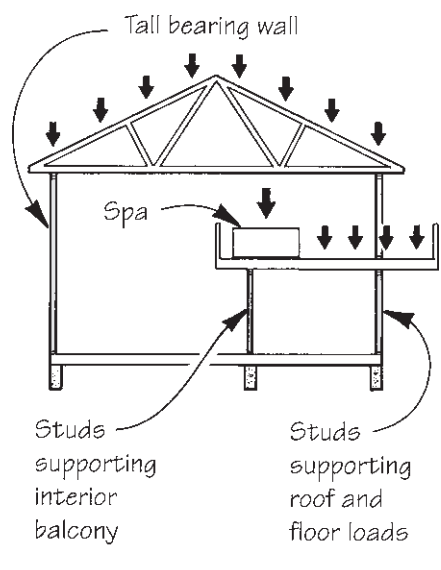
This building section illustrates three areas where you might need to check for stud buckling: tall bearing walls, exterior walls carrying unusually high combined loads, and unsheathed interior bearing walls carrying heavy loads.
